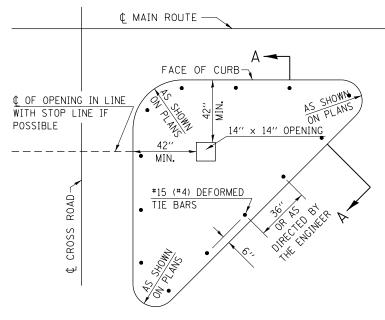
# DETAIL OF CONCRETE MEDIAN, TYPE SM-6 (SM-15) (DOWELED)
